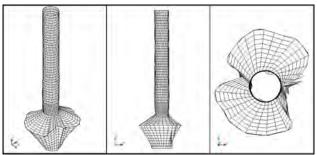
Isometric, Profile and Plan Views of Cave-in of a 1.80 meter Diameter Pile (LOADTEST, Inc.)
